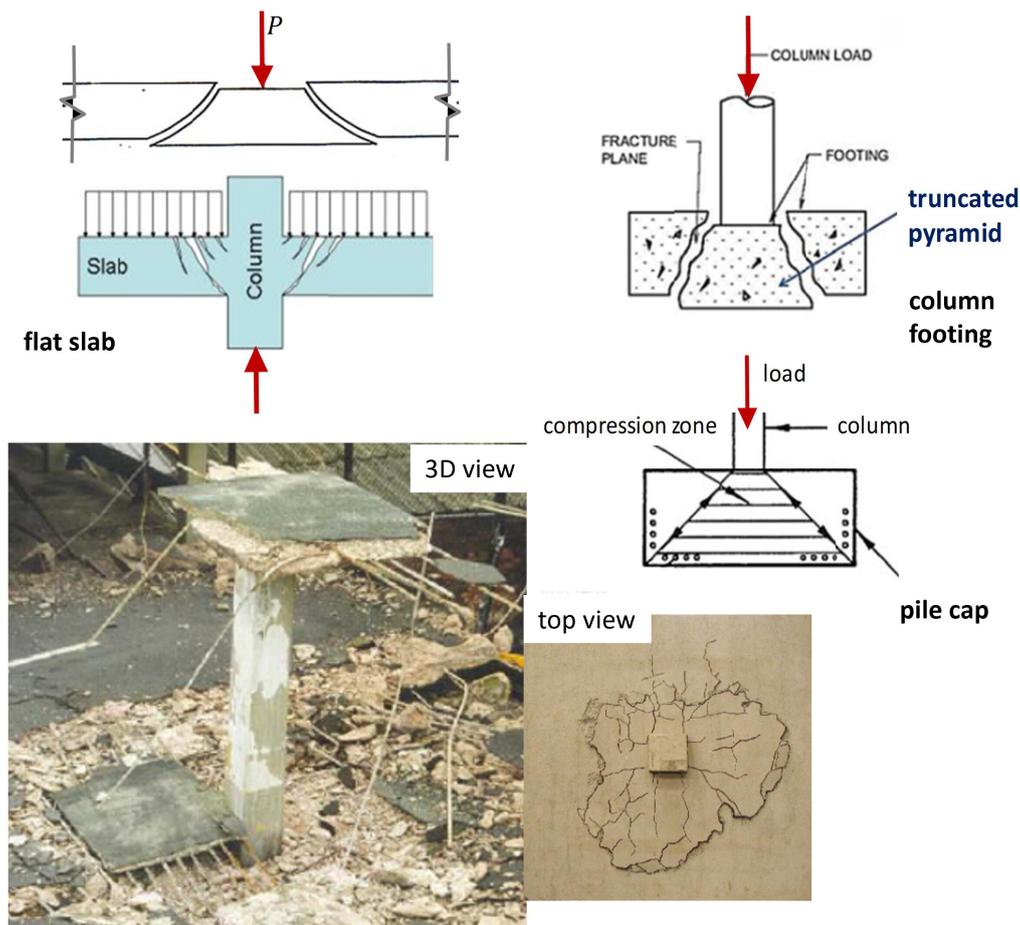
Common cases of punching shear in reinforced concrete structures: flat slabs, column footing, pile caps
